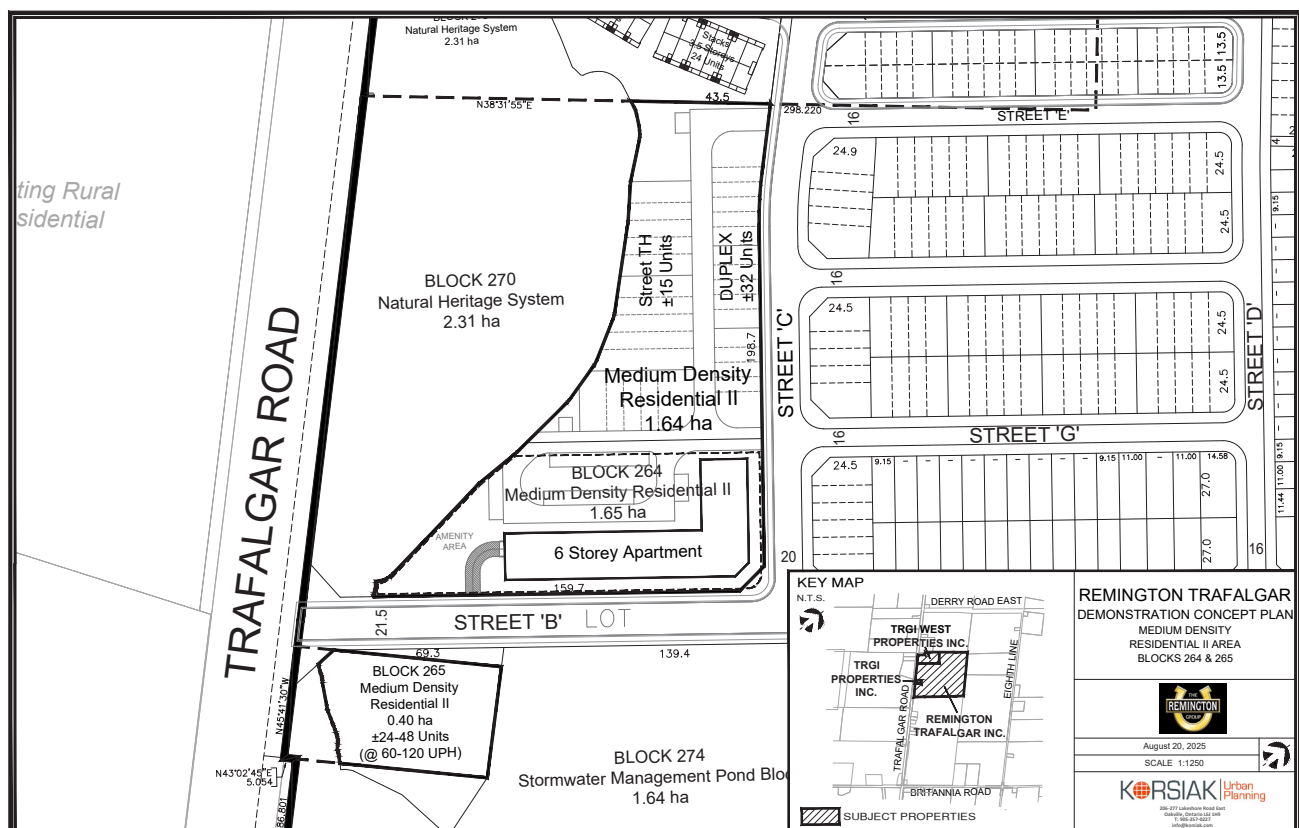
DEMONSTRATION CONCEPT PLAN FOR BLOCKS 264 & 265
